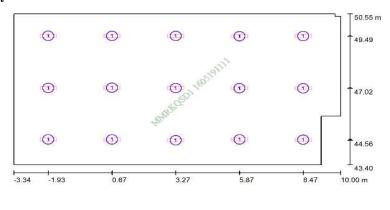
Floor Plan View of Power Electronics Laboratory
